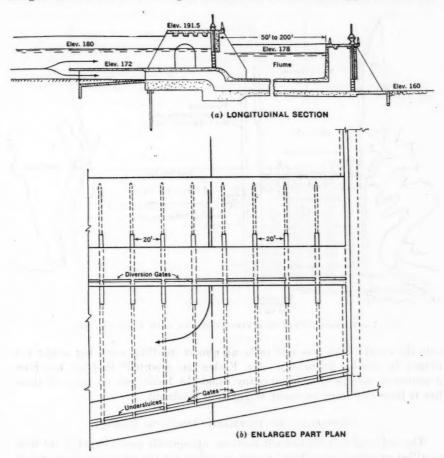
ENLARGED PLAN AND LONGITUDINAL SECTION OF DIVERSION WORKS.
